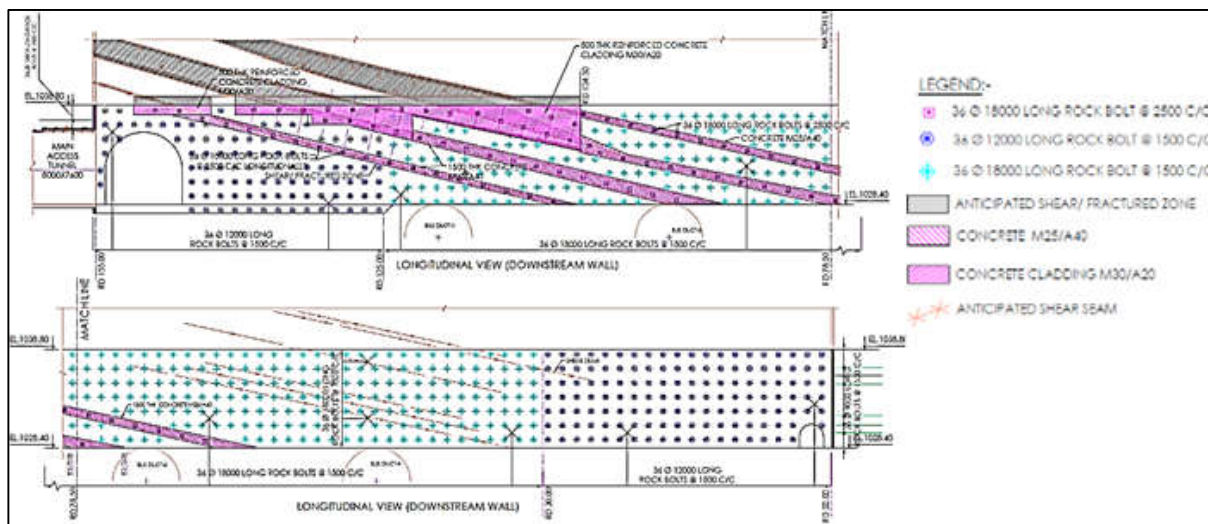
Rock support measures in the downstream wall of Power House Cavern
